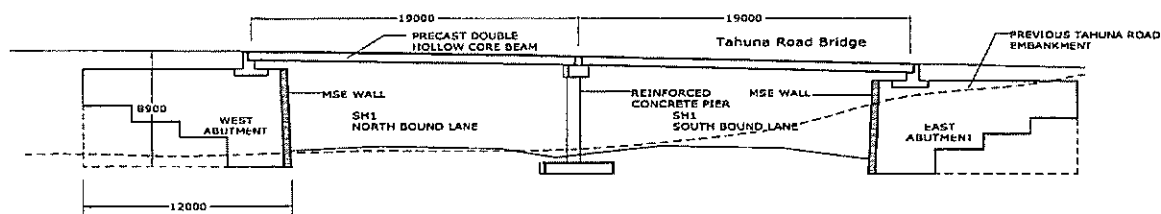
Typical Cross Section of Tahuna Road Overbridge Crossing State Highway SH1
